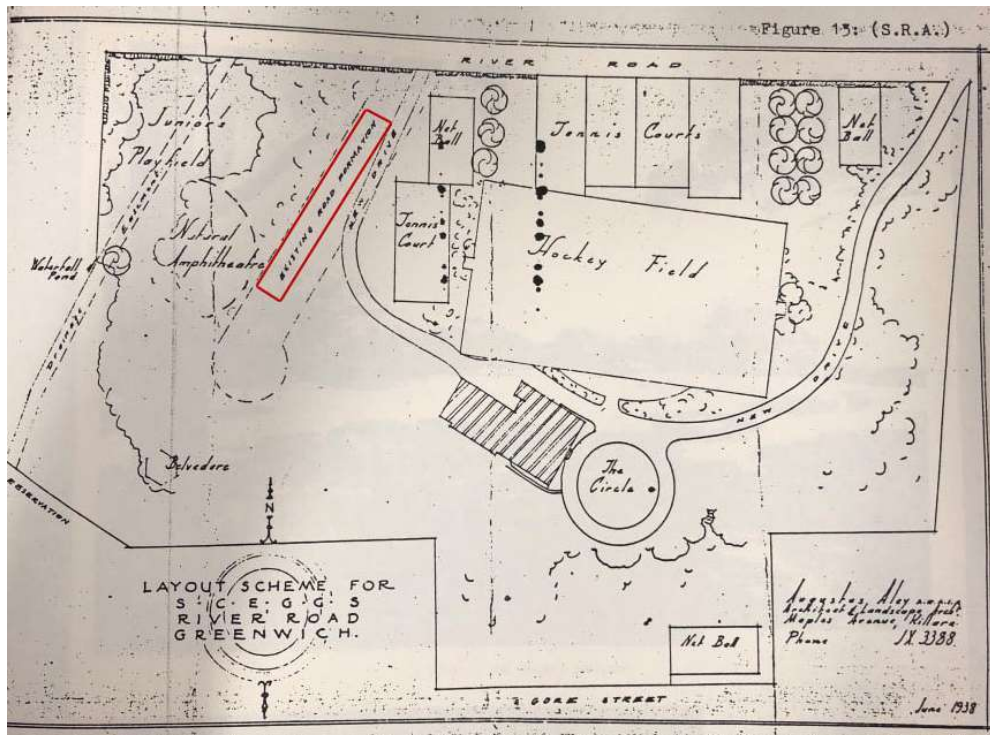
1938 plan by Augustus Aley for the proposed layout for the new SCEGGS premises. Note his annotation for 'existing road formation', as outlined in red. This suggests an earlier road. (Source: Macdonald 1985, Figure 13)
